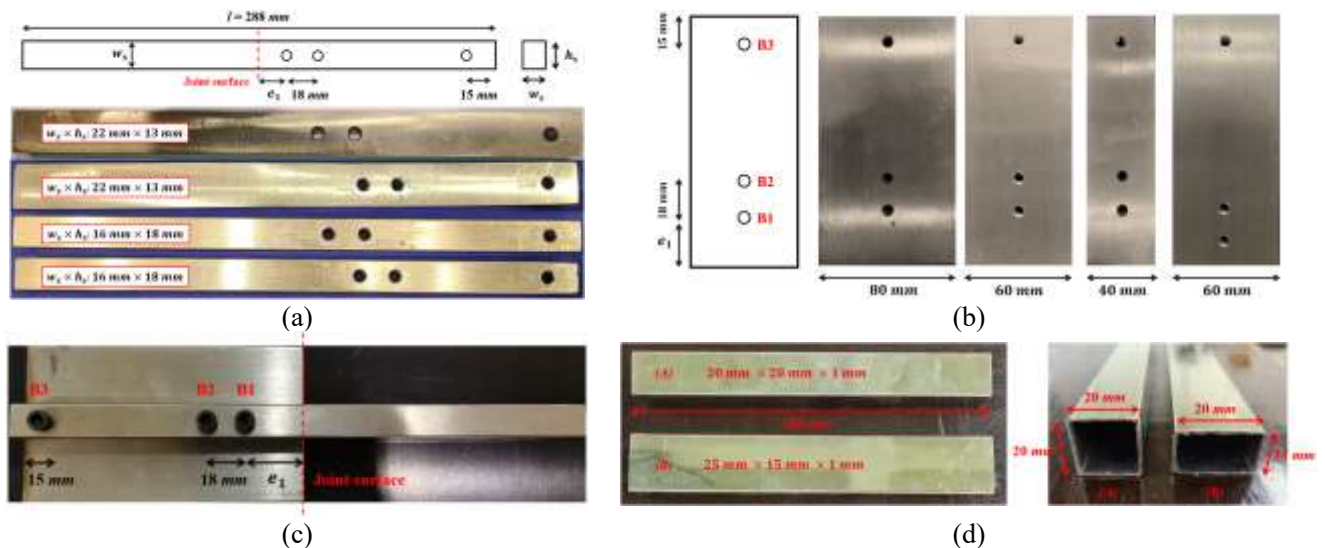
Dimensions of demountable stainless steel bar connection system (a) stainless steel bar connection, (b) stainless steel plate, (c) assembled plate and connection (d) stainless steel tube.
